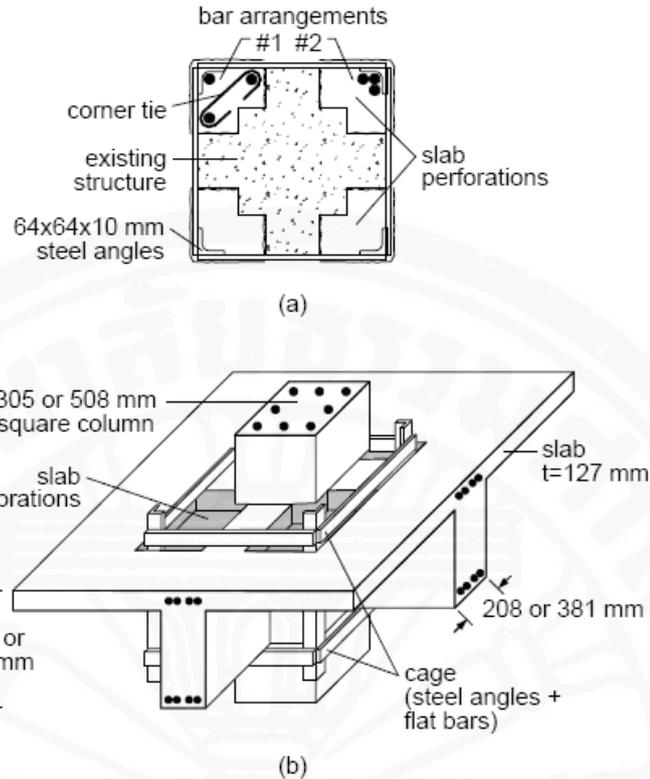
Concrete jacketing technique studied by Alcocer and Jirsa (1993)
